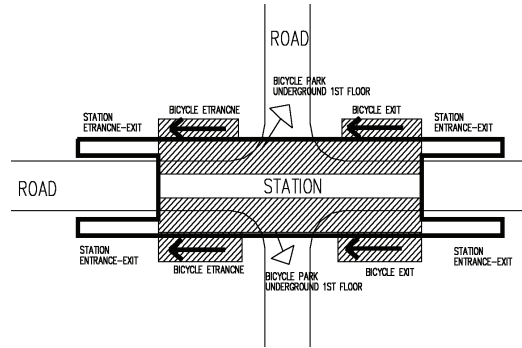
Bicycle-rail transit-tube interchanging transport system patterns in General distribution station on the 1st floor underground.
